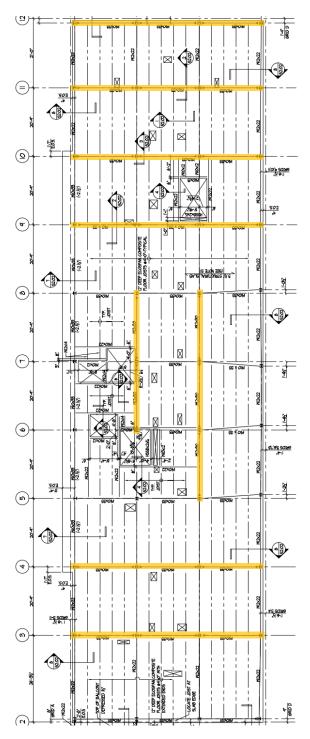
Typical Floor Plan, moment frames shown highlighted, S1.07
